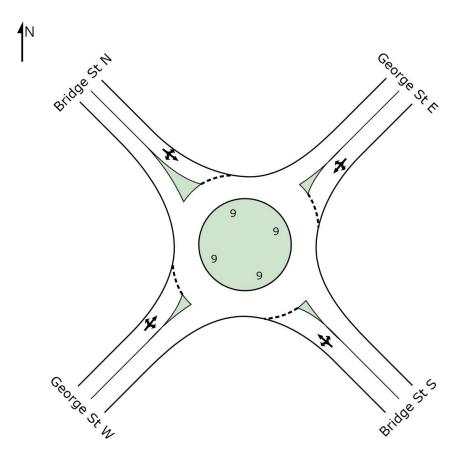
2011 AM Peak SIDRA Summary - Bridge Street/ George Street
